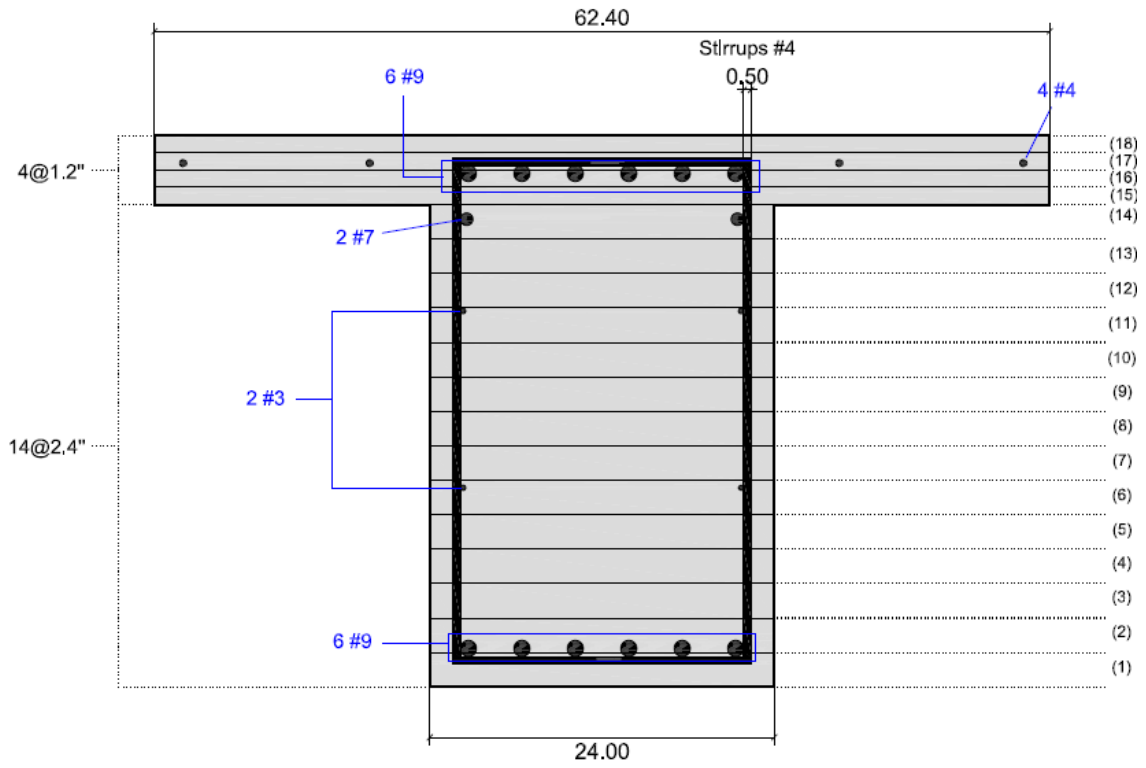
Cross section 1 for Specimen 1. Dimensions in inches.
